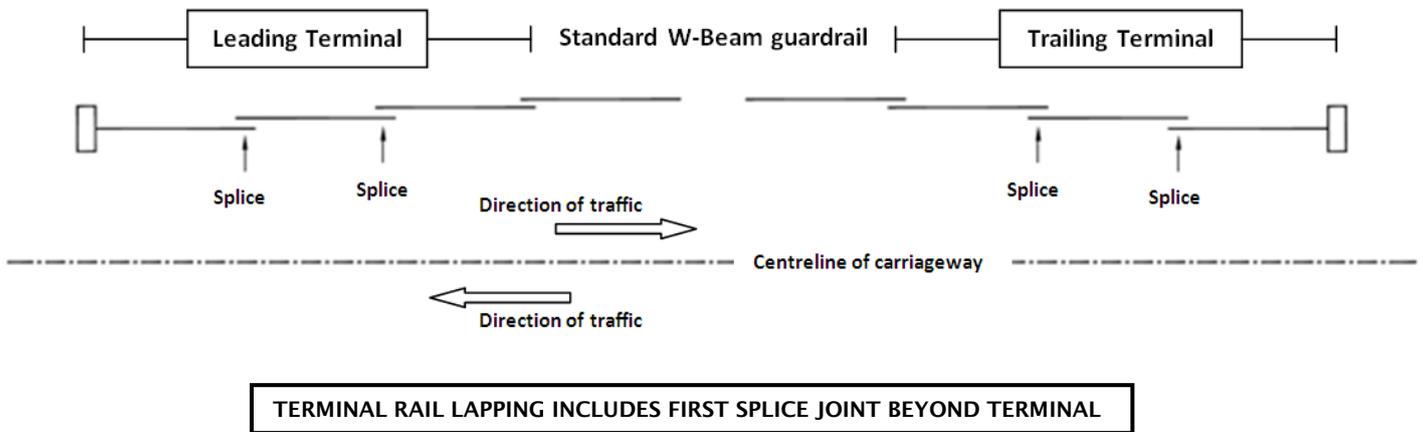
Lapping of semi-rigid guardrail (W-Beam or Thrie-Beam)
